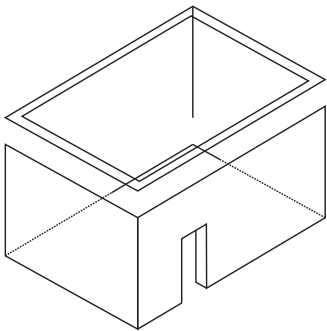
OUTDOOR AREA - EXAMPLE 1
